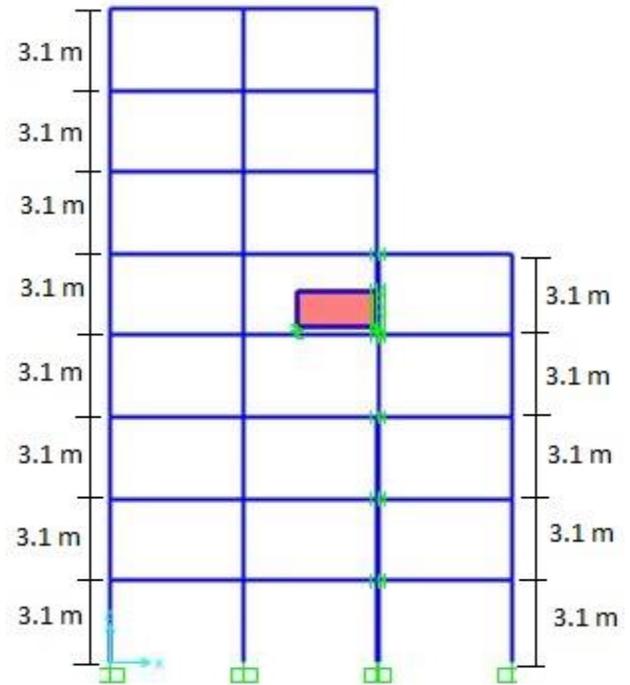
Elevation view of adjacent buildings while NSE is incorporated at 4<sup>th</sup> level of building A.
